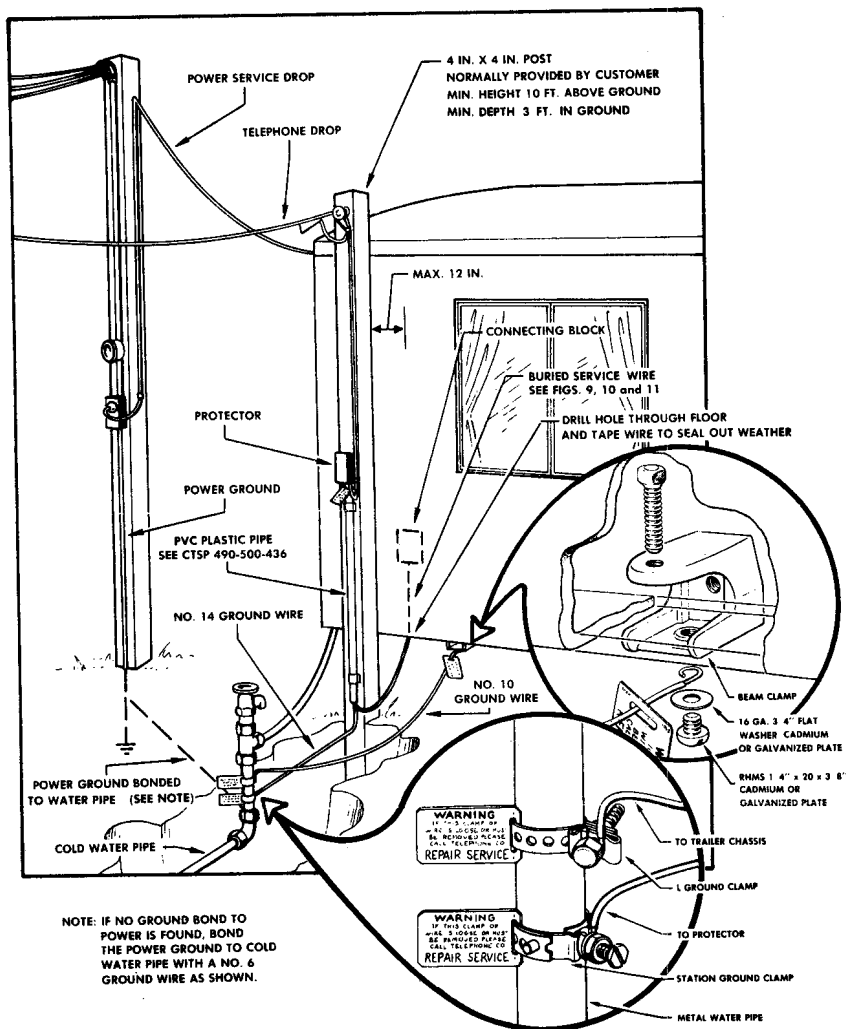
Typical Installation—Aerial Distribution Water Pipe Ground
